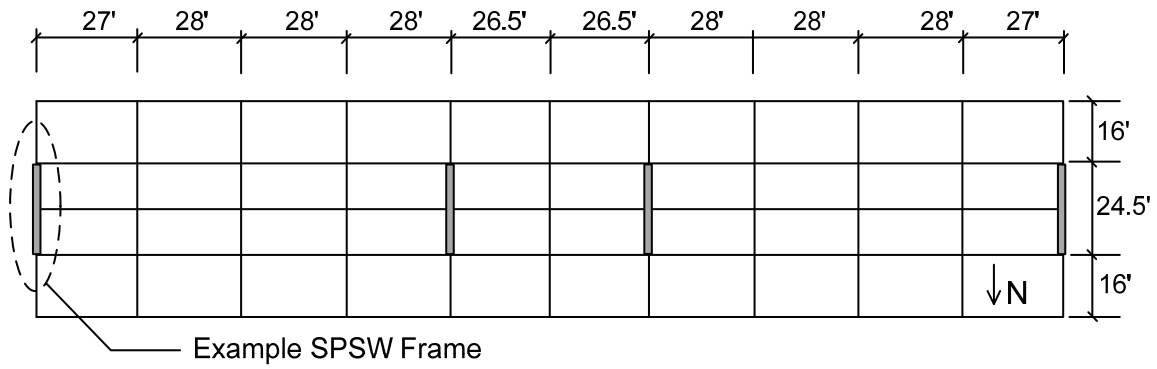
Plan View of the MCEER Demonstration Building (Yang and Whittaker, 2002).
